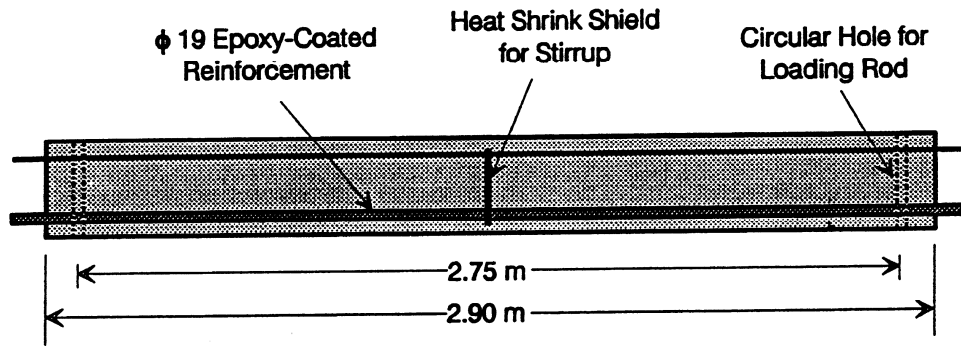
Details of Group I Beam Specimen (Longitudinal Steel).
